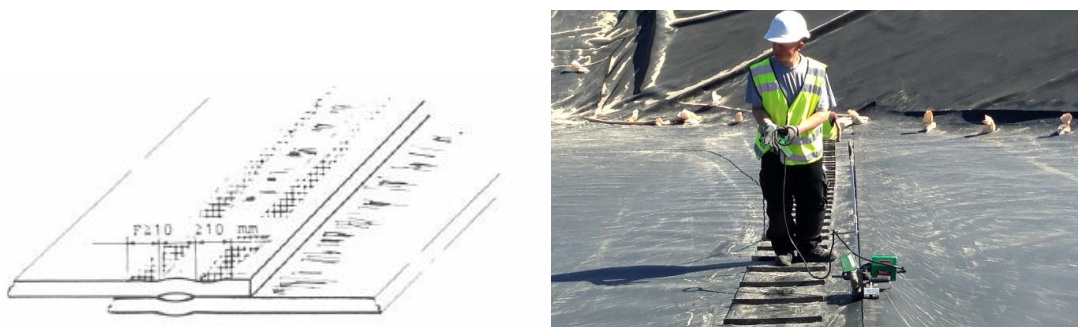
Double welding of a HDPE liner. The welding can be tested by applying pressurized air to the air channel between the welding seams. (PlanEnergi)
